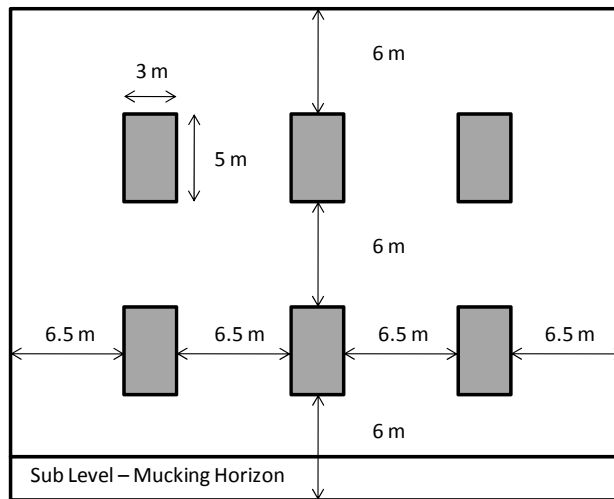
Proposed Room-and-Pillar Stope Configuration for the Croinor Project (Plan View).
